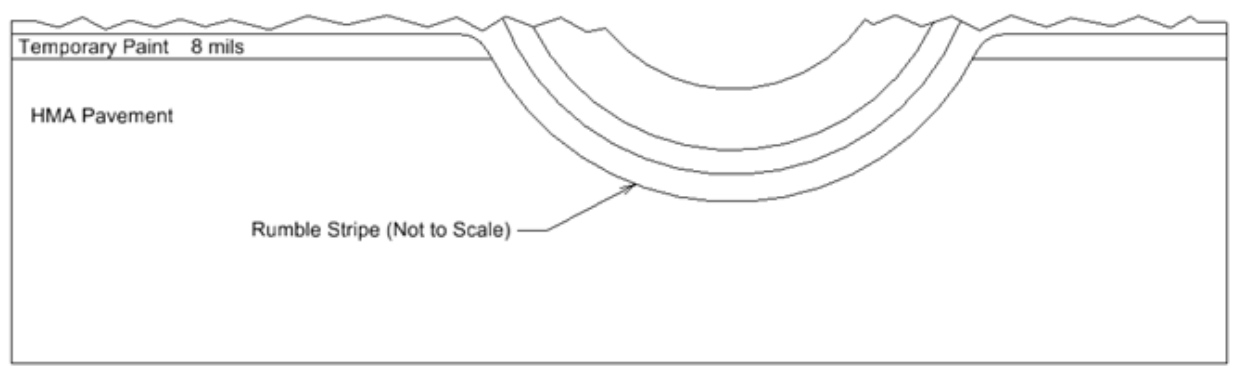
Longitudinal Cross section of pavement marking system after delamination.
